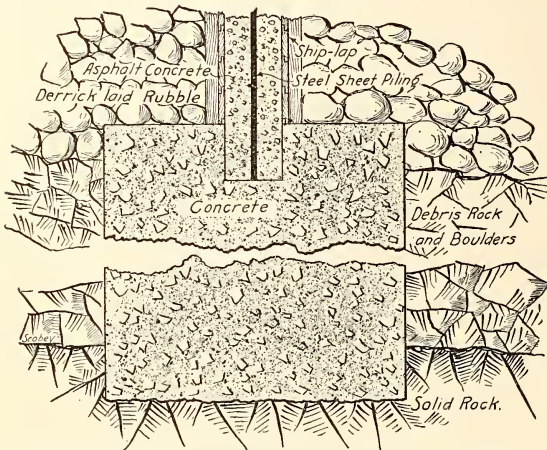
Section of concrete base with steel core protected by asphalt concrete encased in wooden forms.
